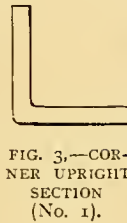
CORNER UPRIGHT SECTION (No. 1).
